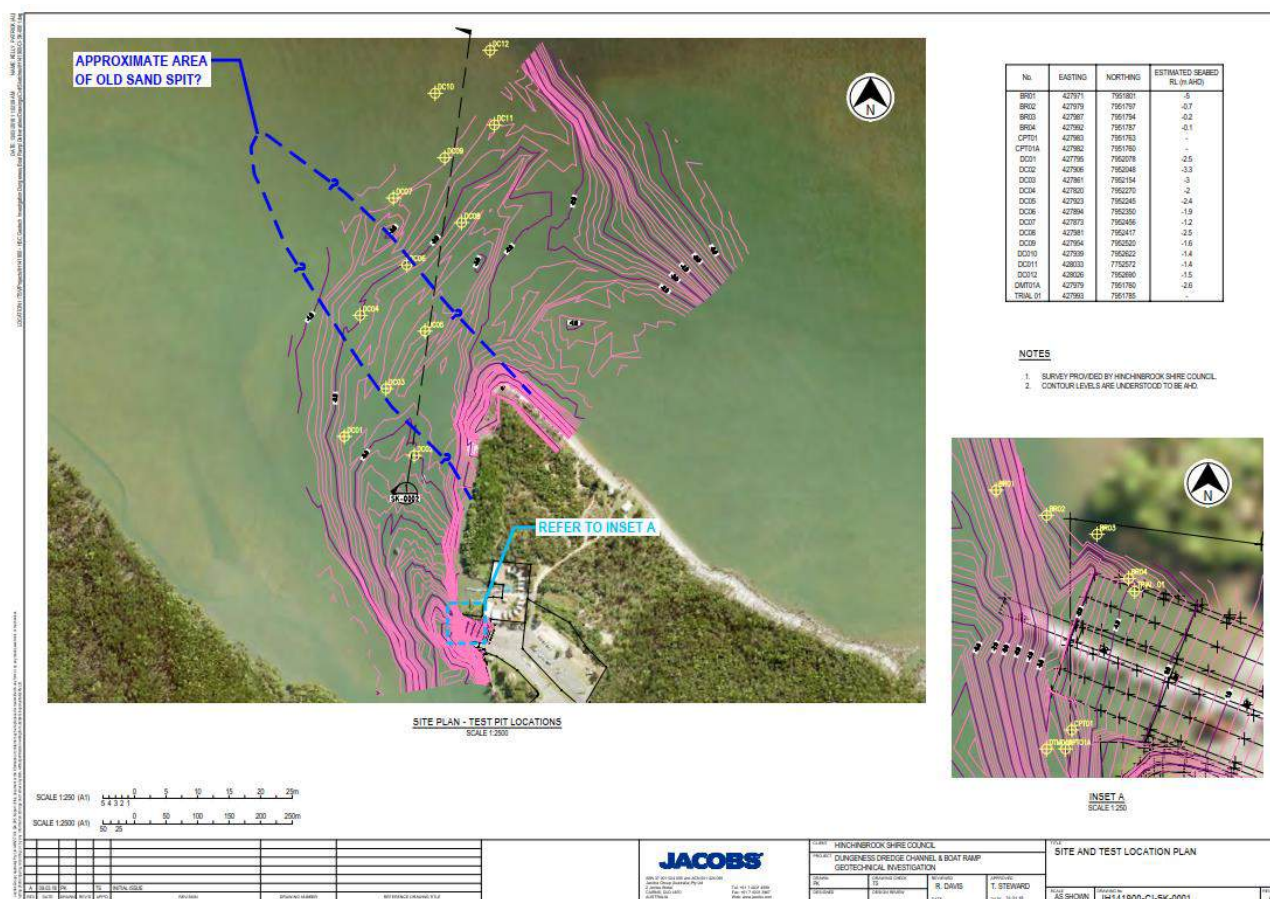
Site plan and test pit locations (Jacobs, 2018)
